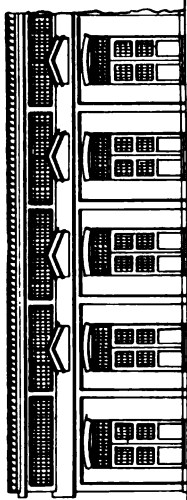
SIDE ELEVATION TOWARDS TRANSFER
